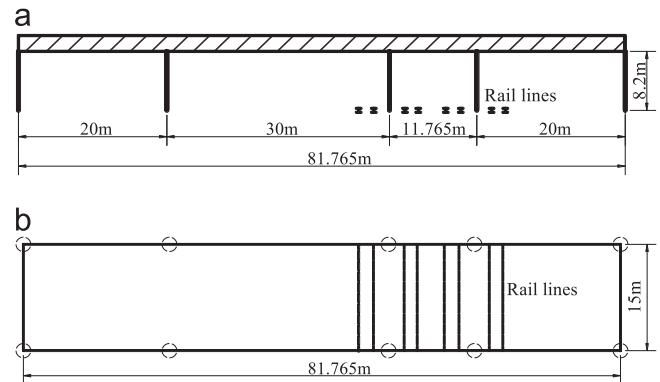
General arrangement of overhead bridge. (a) Elevations view of overhead bridge. (b) Plan view of overhead bridge.
